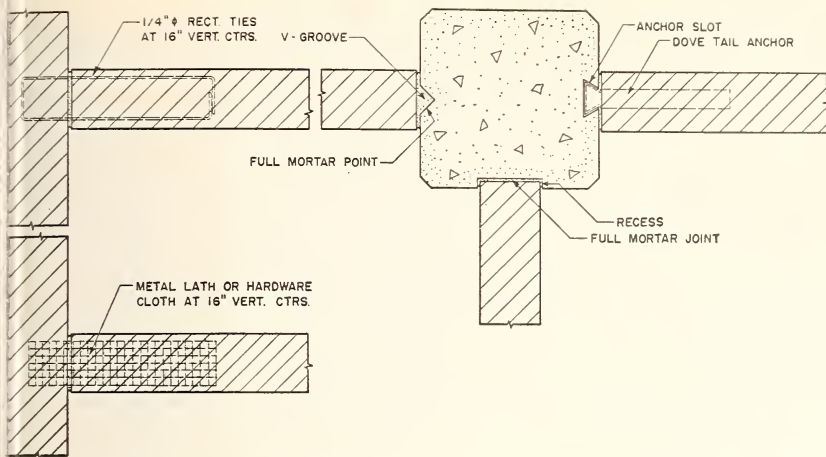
Examples of bonding or anchorage of nonbearing walls.
